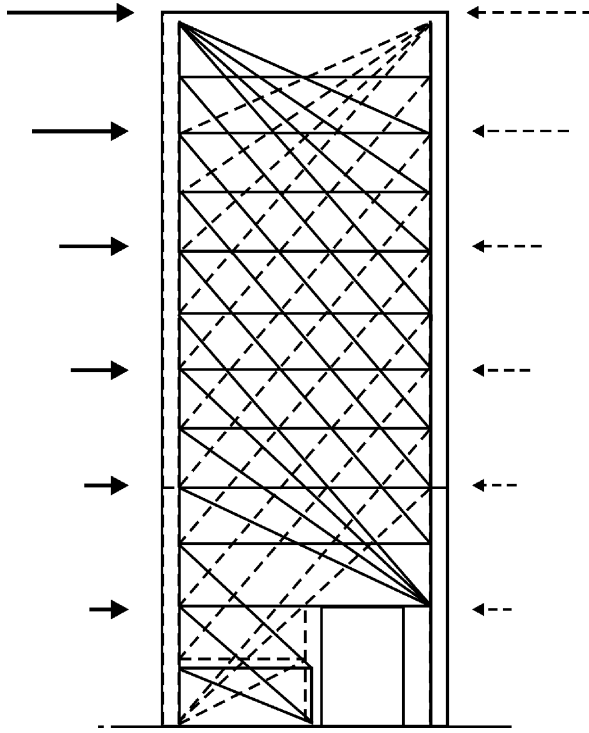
Example of a Strut-and-Tie model for a wall with openings
